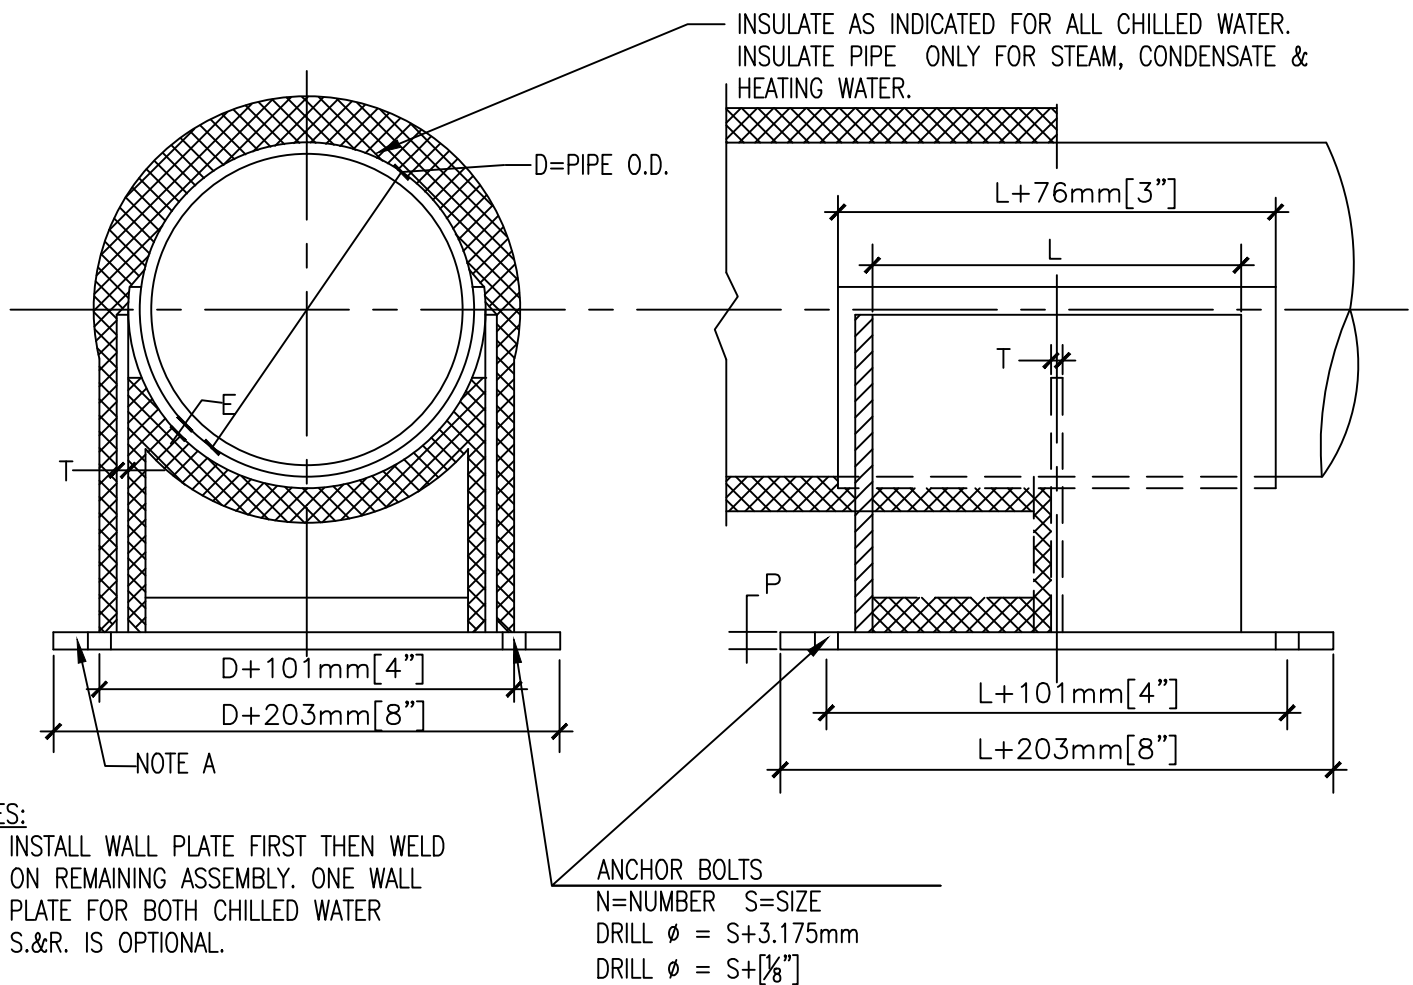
DETAIL TITLE: SMALL PIPE ANCHOR 38-104mm $[1-1\frac{1}{2}"-4"]$
